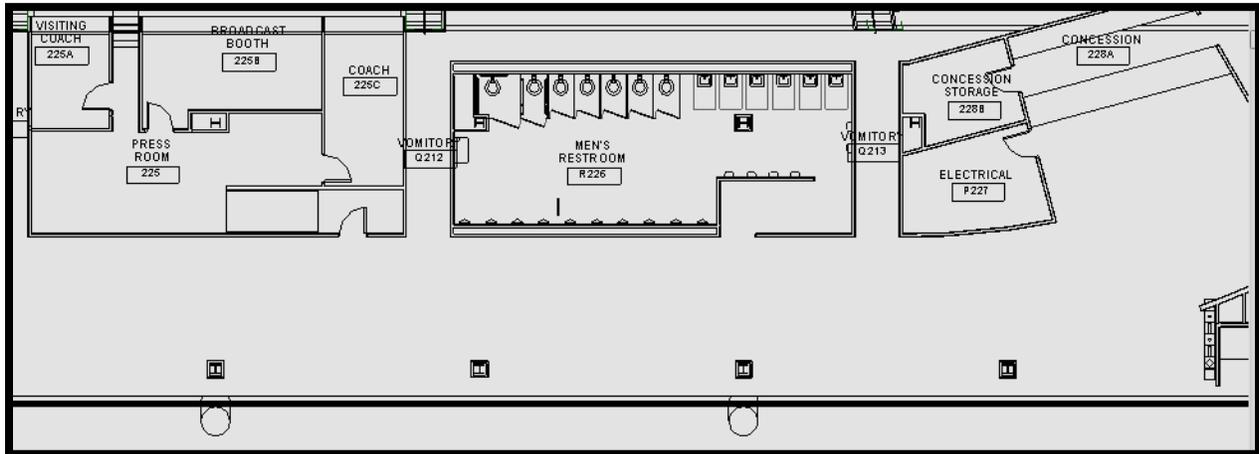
South Portion of the New Main Concourse Level Floor Plan
